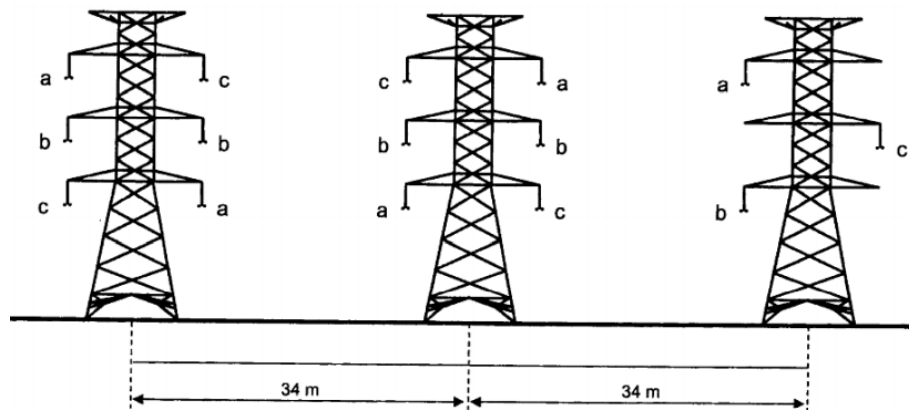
Recommended tower spacing distance and phase arrangement. Lines between the plant and the Tocola substation at 400kV.
